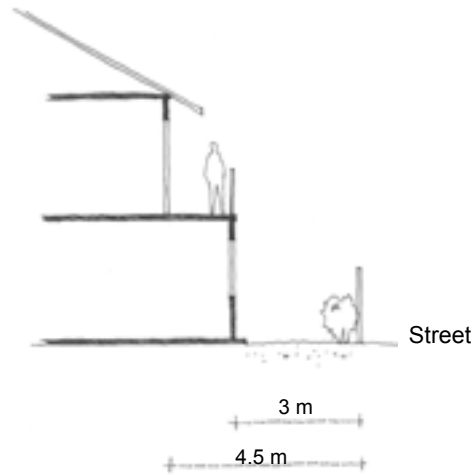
Setbacks from secondary street frontage for corner allotments.
